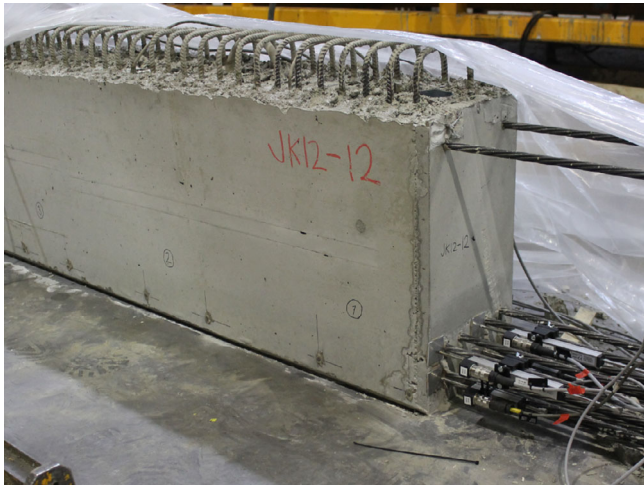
Instrumentation of beam JK12 at concrete manufacturing plant
